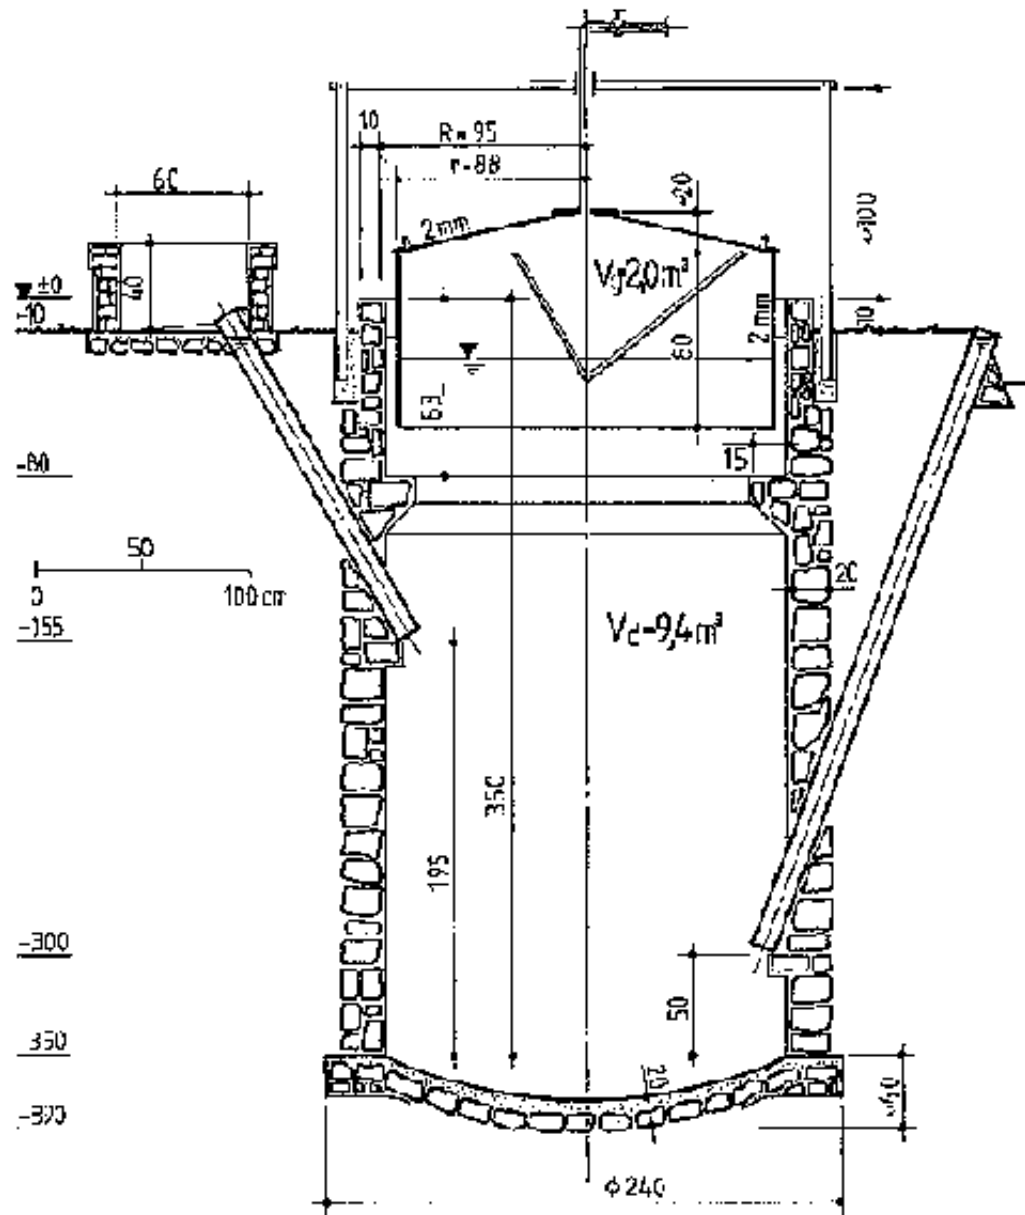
Constructional drawing of a cylindrical floating-drum plant for quarrystone masonry. $V_d = 9.4 \text{ m}^3$, $V_g = 2.5 \text{ m}^3$. Material requirements: Excavation 21.0 m^3 , Foundation 1.0 m^3 , Masonry 5.4 m^3 , Rendered area 27.3 m^2 , Sheet steel 6.4 m^2 . (Source: OEKOTOP, KVIC)
